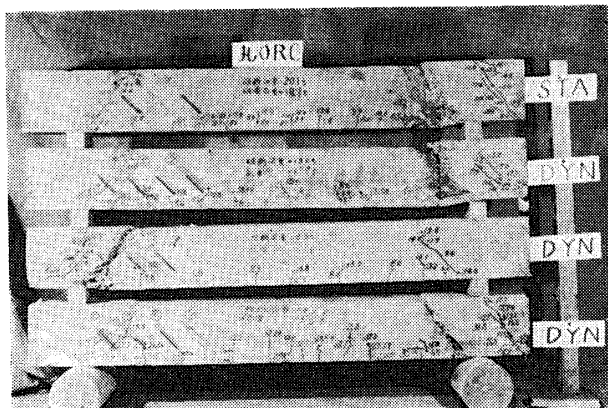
a Left side crack of ORC steel bar beam Photo.3 b Right side crack of ORC steel bar beam
